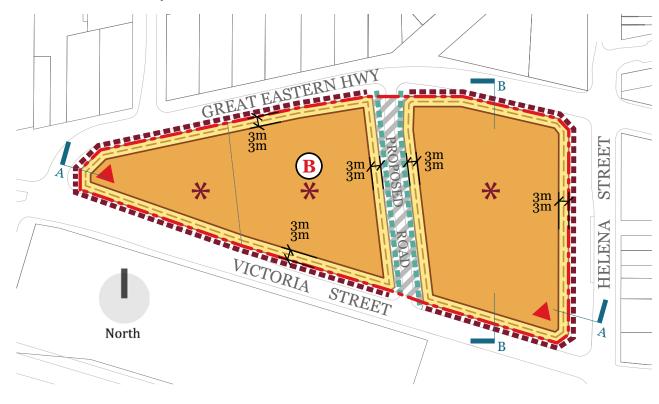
SITE B SITE SPECIFIC PLAN
